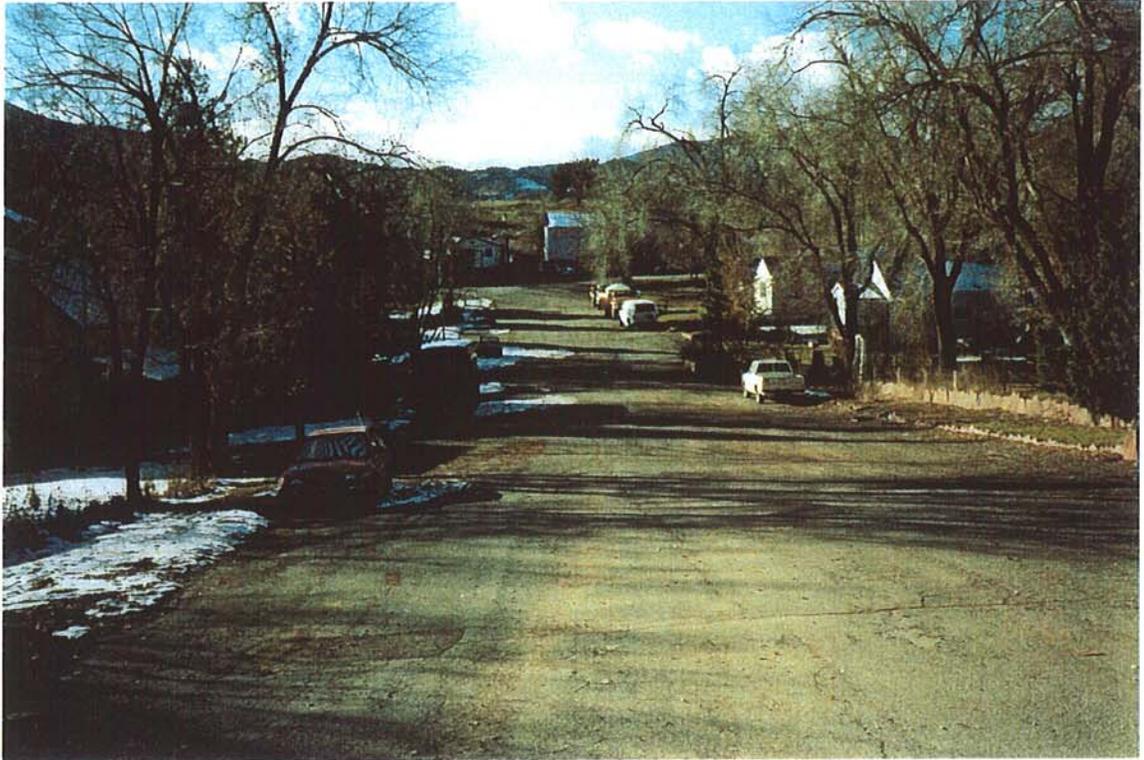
Many of the roads in the old section of town have a sag between intersections. Streets constructed in this manner cannot help to convey stormwater through town. Also, the absence of curb and gutter further prevents containment of stormwater runoff. Homes in these areas are subject to flooding in a significant storm event.
